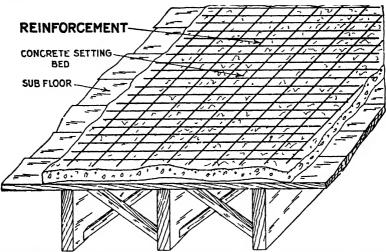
,844—Approved construction of placing a reinforcement, usually wire netting, on top the concrete setting bed to distribute the stresses and prevent cracking of the mortar setting bed
